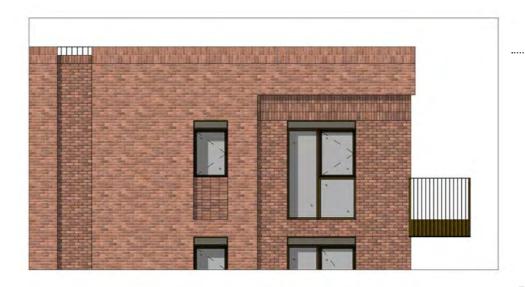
Detailed elevation study: bookend (A1 north facade)
